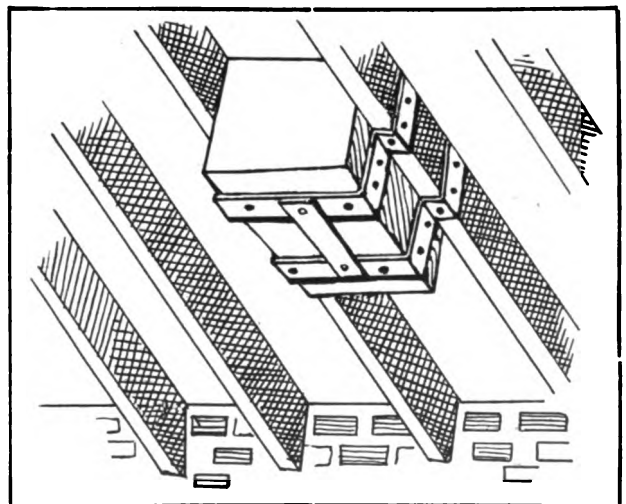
How Automobile Pit Can Be Installed in the Garage Floor.
